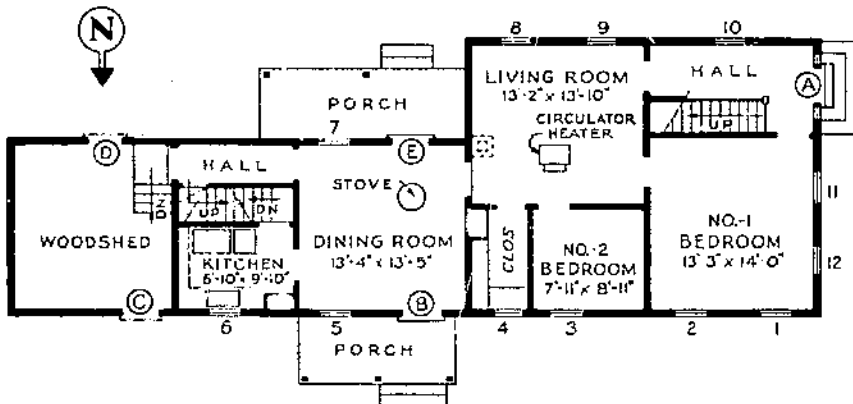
First-floor plan of house No. 4, showing location of heating equipment.
